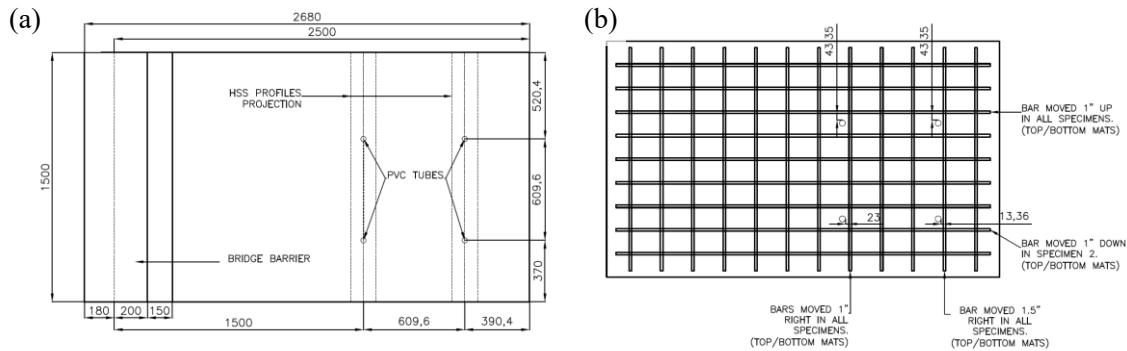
(a) Typical plan view of specimens with final location of PVC tubes for connection to rigid floor, and (b) plan view of rebar adjusted due to interferences with PVC tubes. Measures in mm or as indicated.
